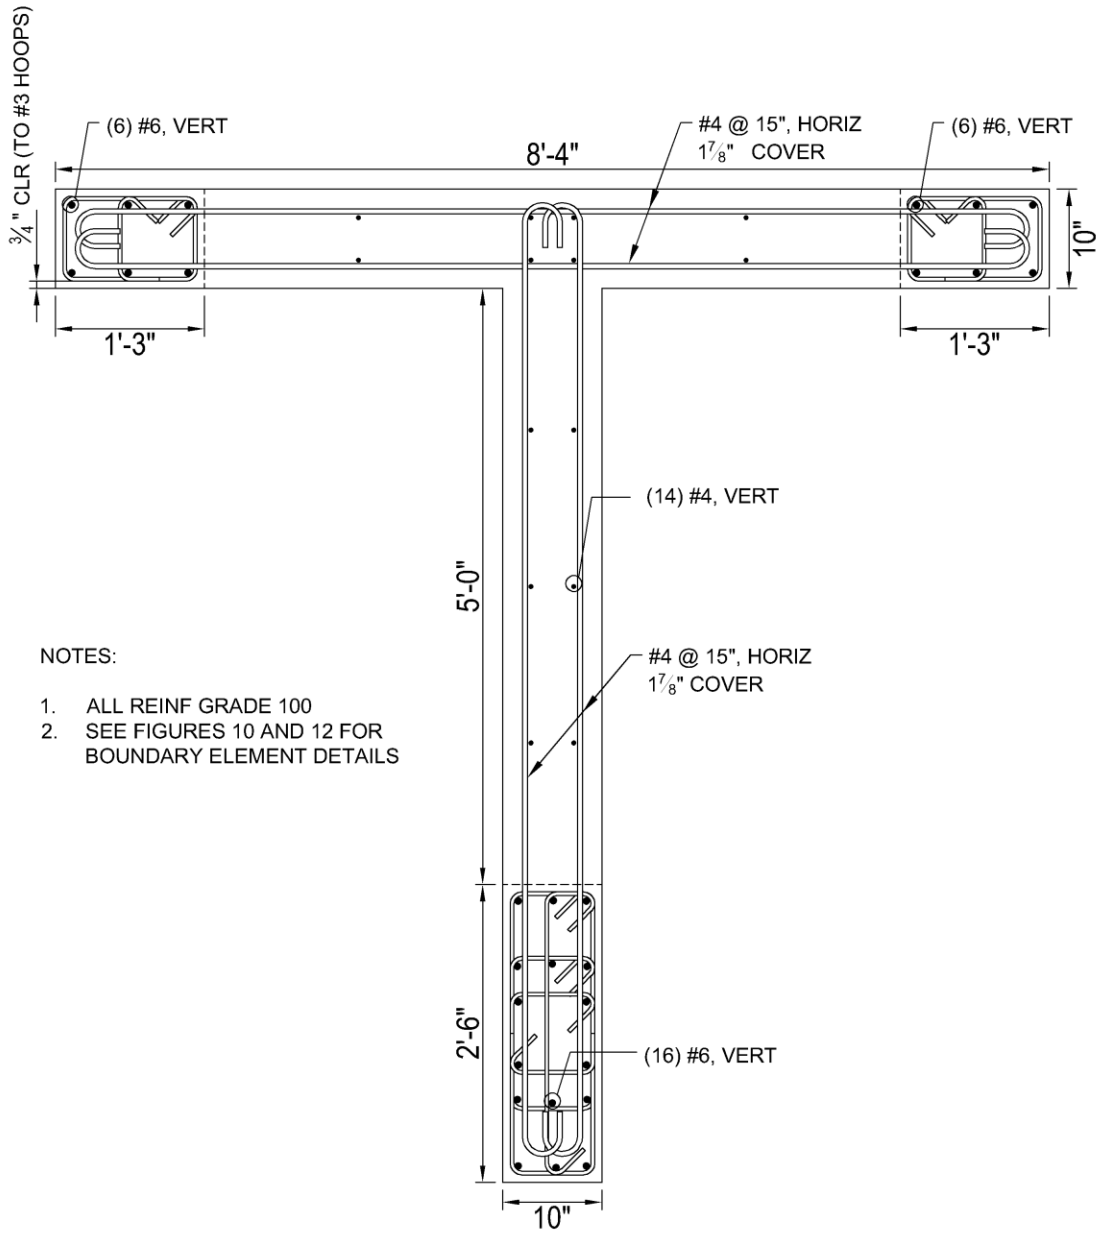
Reinforcement layout for T4 (1 in. = 25.4 mm)
